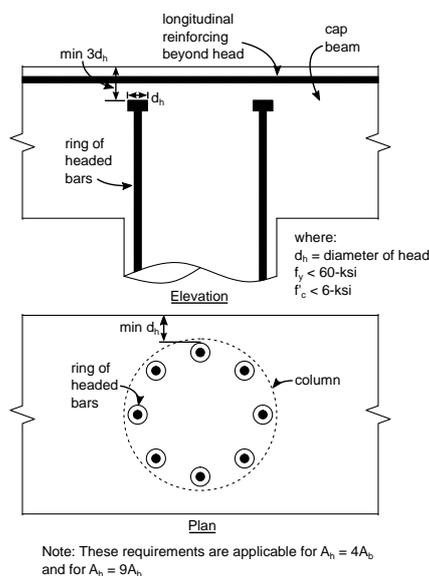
Cover Requirements for Headed Reinforcing
